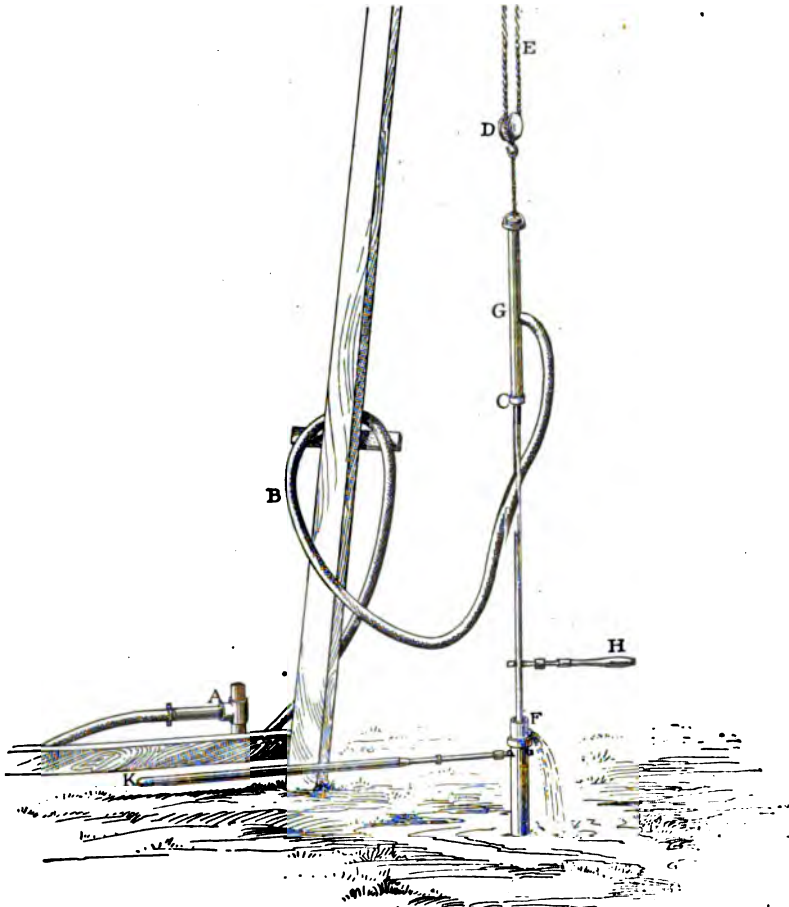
Portion of well-drilling outfit of Bacon and Gamble, sinking a well at Ponchatoula by the jetting process.
